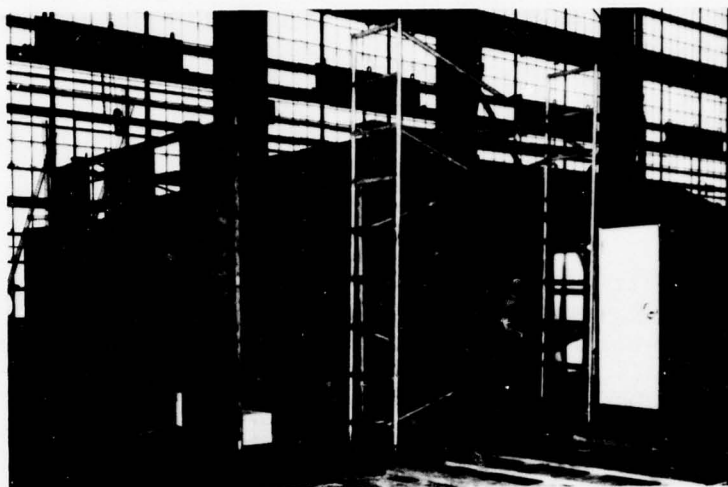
View showing shelter, wooden reference "wall" for the side wall deflection measurements and staging supporting ladder used in loading shell roof.
